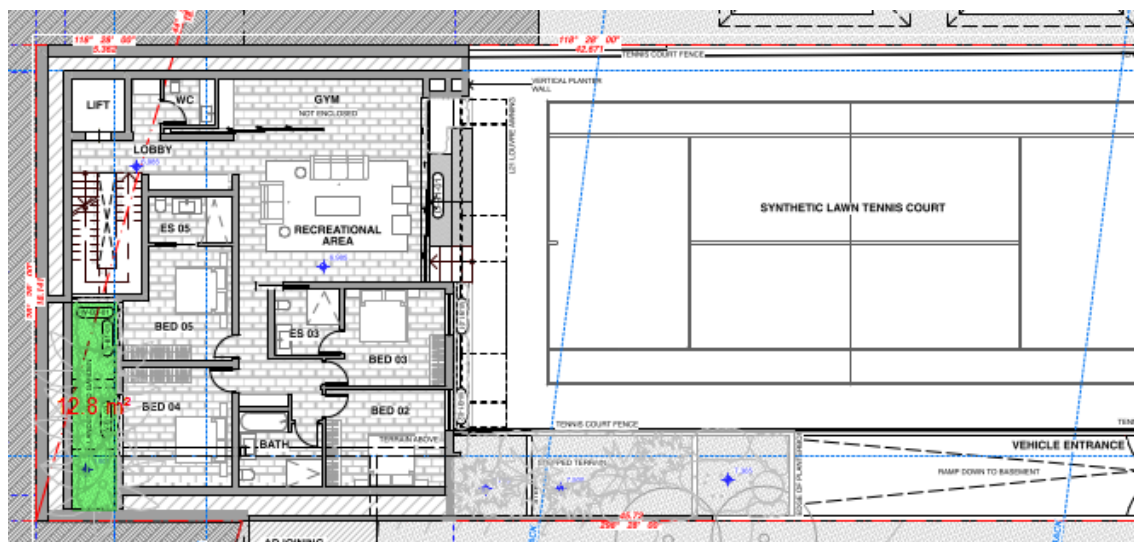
Site/floor plan indicating calculable landscaped areas shaded green
